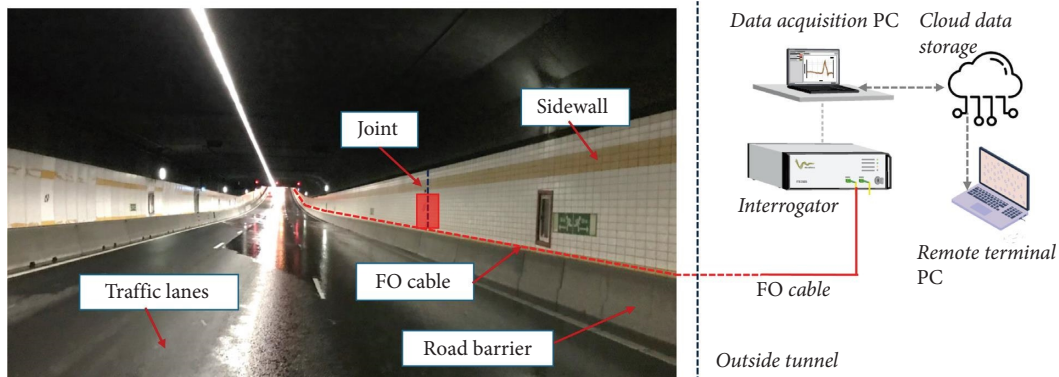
Heinenoordtunnel west sidewall to be instrumented by a remotely controllable DFOS system.
